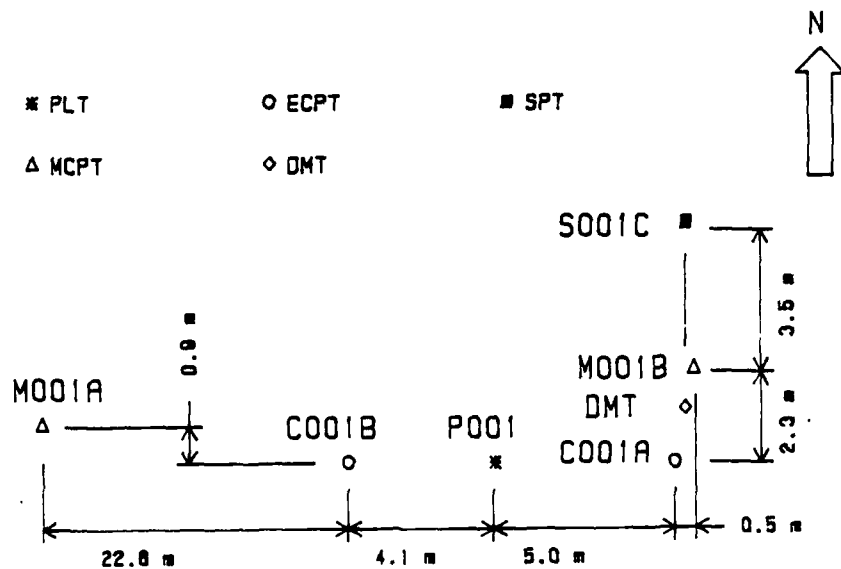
Apalachicola River Bridge Pier 3 Tests
